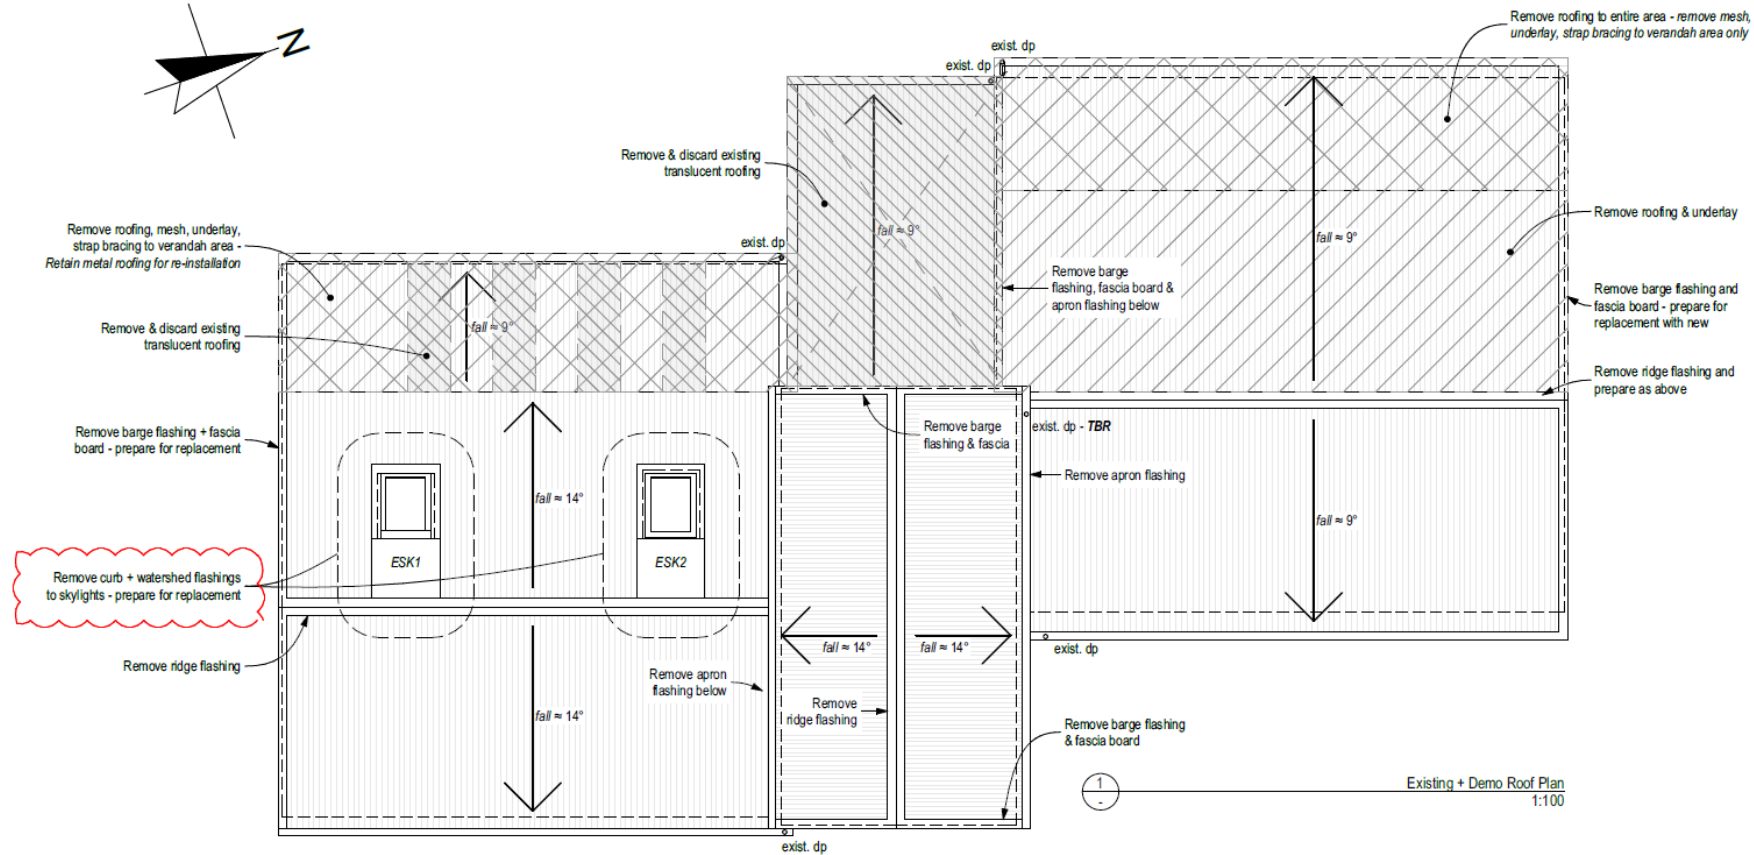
A Roof plans – Existing and proposed works – 120 series Architectural drawings
